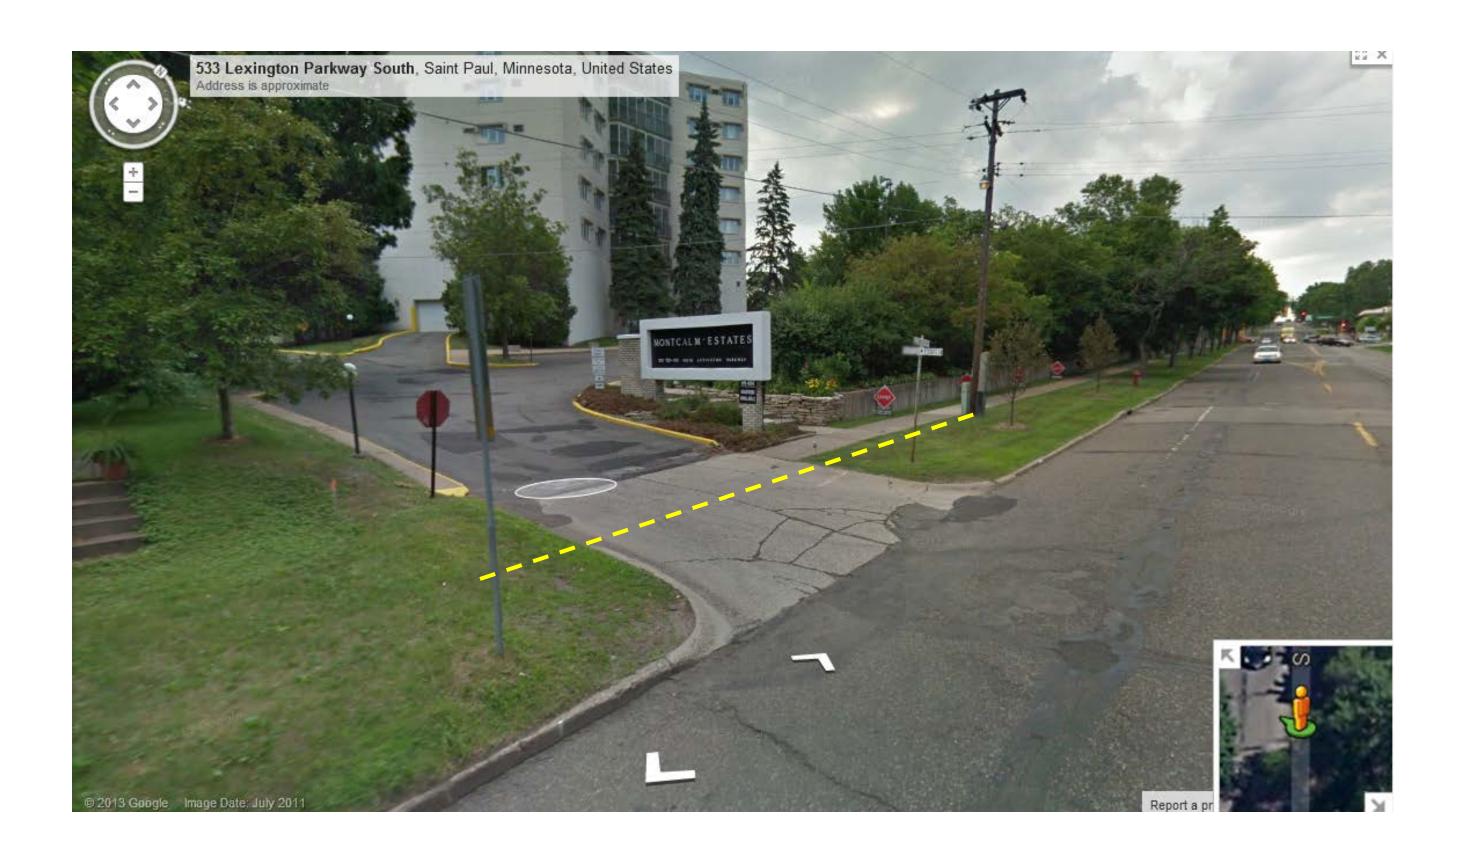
Exhibit B – Proposed CenturLink Cable Installation on Lexington Parkway Crossing of Randolph Avenue
